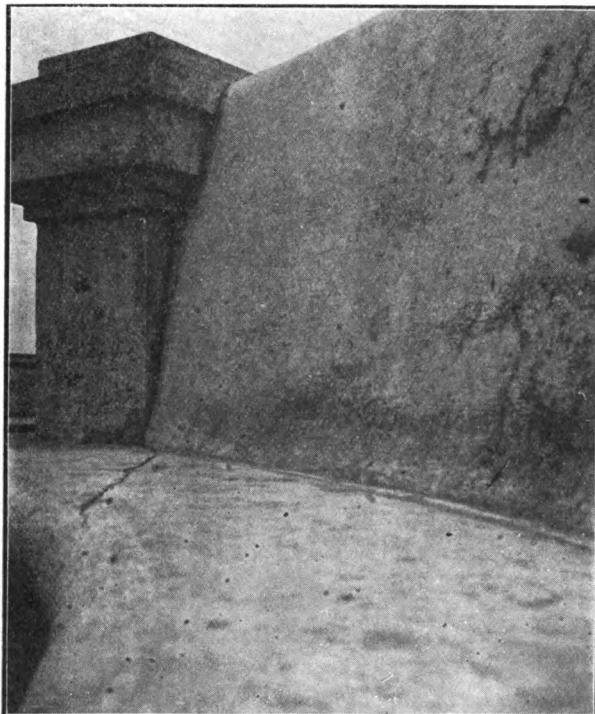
Parapet of the Y Bridge at Zanesville, Ohio, Showing Hair Cracks and Surface Corrosion.
